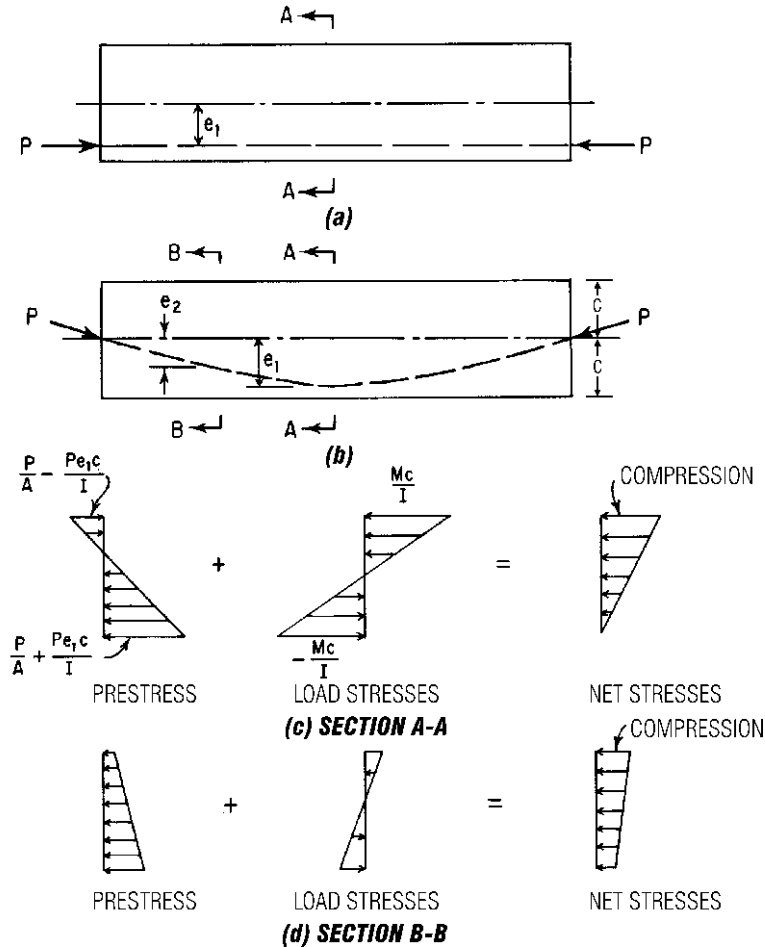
Concrete beams: (a) Prestressed with straight tendons. (b) Prestressed with draped tendons. (c) Stress distribution at midspan. (d) Stress distribution for draped tendons at section between support and midspan. For straight tendons, net stress may be tensile near the supports.
